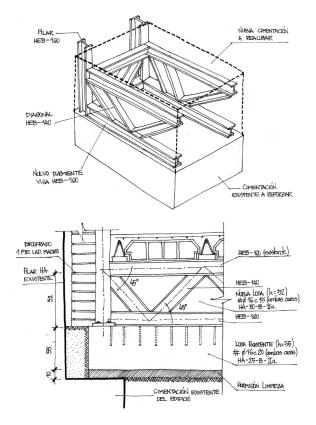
Construction detail of structural reinforcement (graphic elaboration by the authors).
